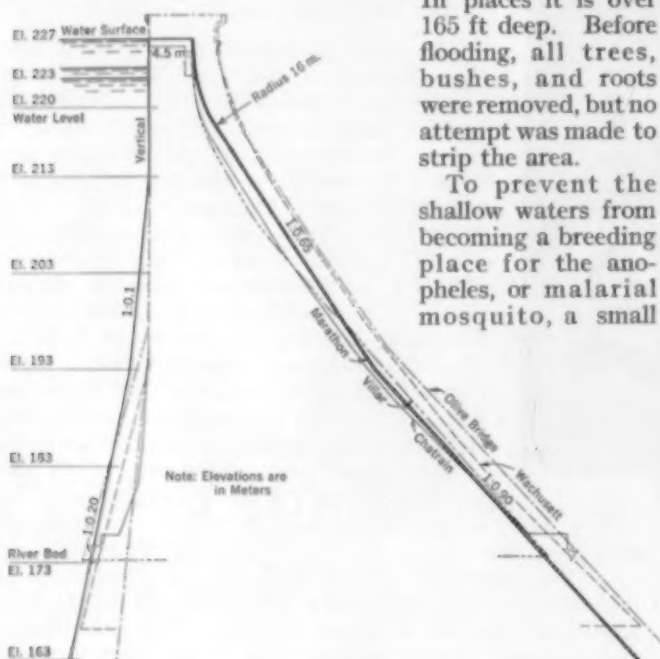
MAXIMUM CROSS SECTION OF THE MARATHON DAM
